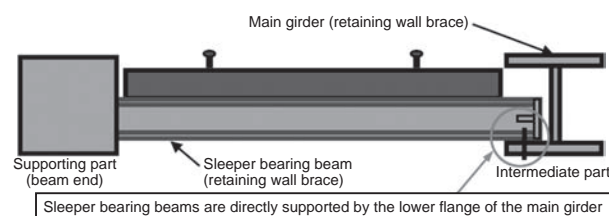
Temporary Girder Using Steel Retaining wall brace (cross section)
